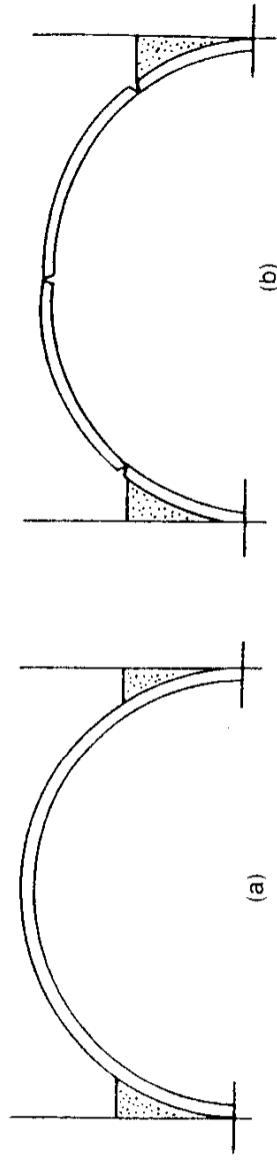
The cylindrical barrel vault: (a) undeformed, (b) cracked
